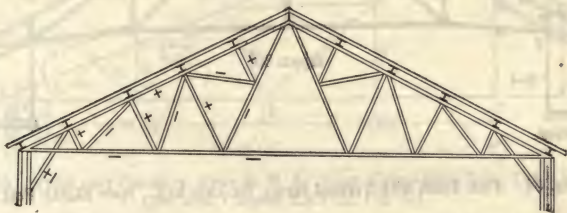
Fink Truss with Knee-braces. Span Sixty-eight Feet
